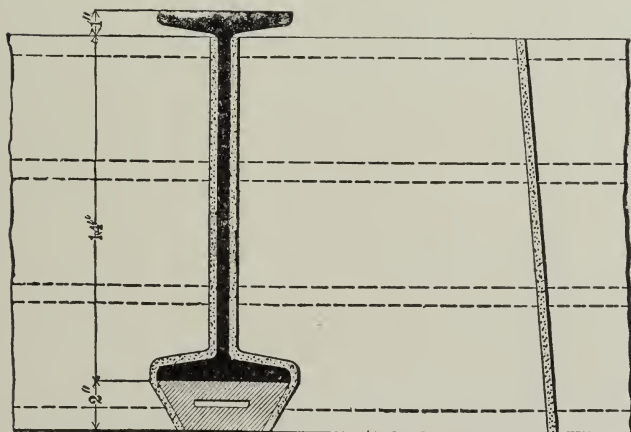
End-construction Detail. Skew-back and Beam Flange Covering.
